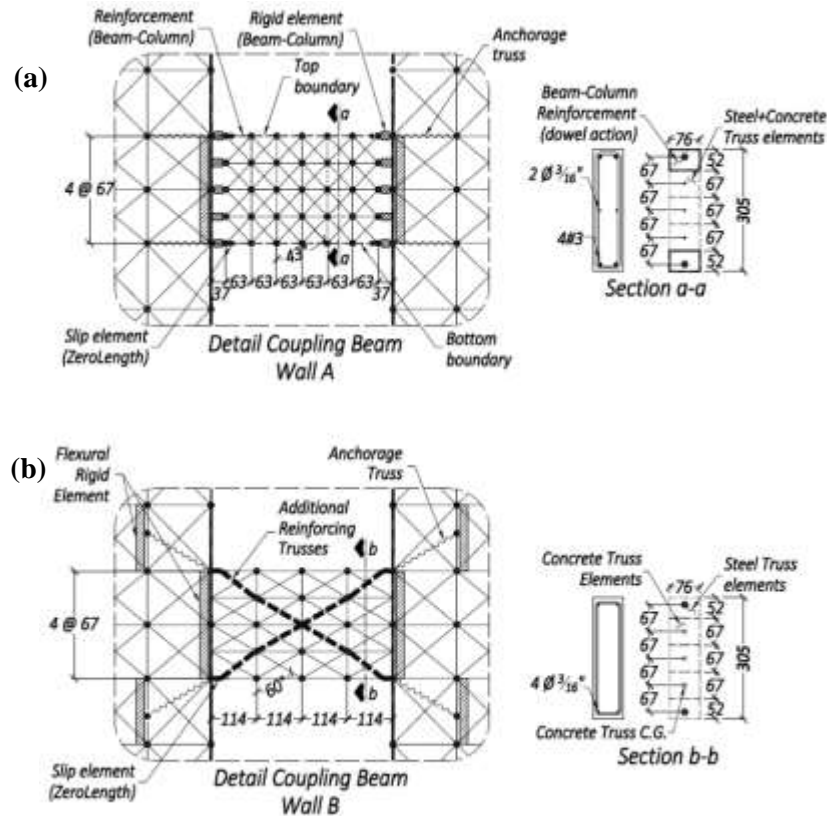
Coupling beam modeling details used in the EBTM. (a) Specimen Wall A. (b) Specimen Wall B.
